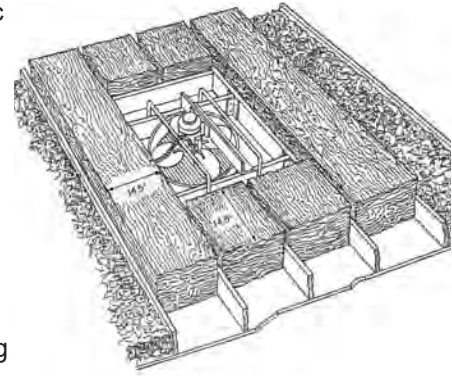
WHOLE HOUSE FAN INSULATION BOX (BLOCKING)
